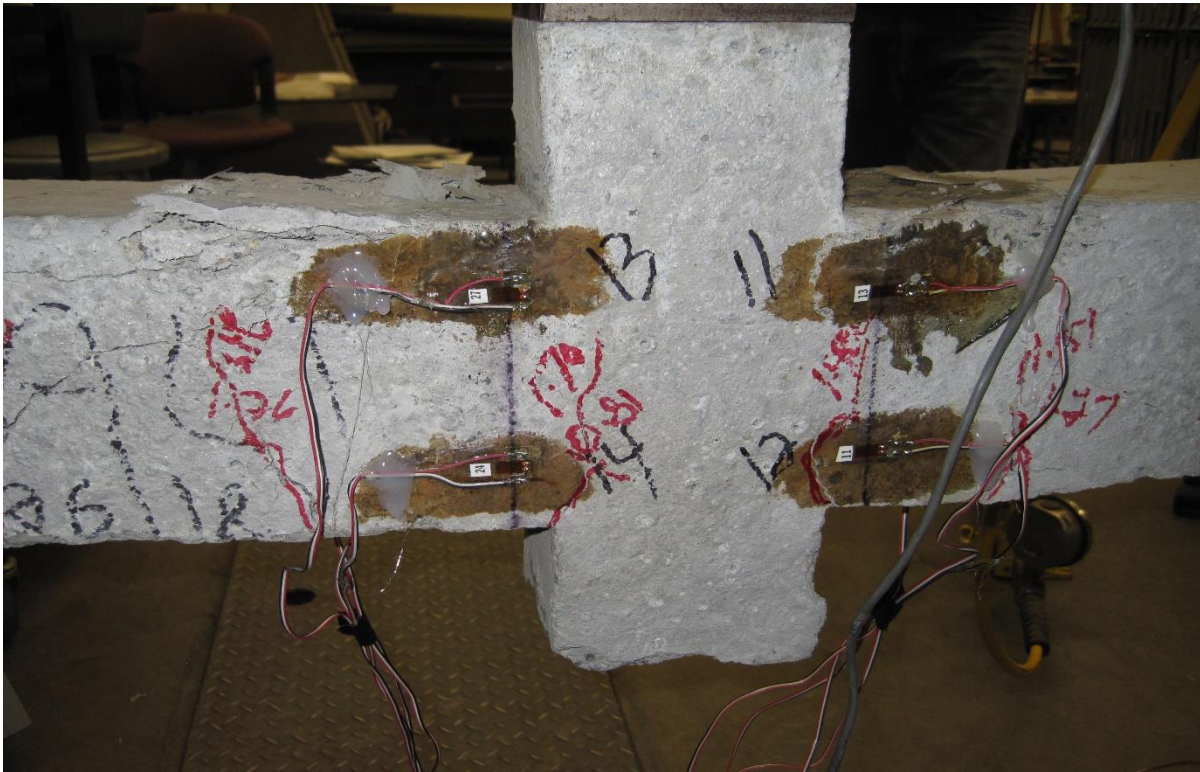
Missing Column Crack Pattern at the Collapsed Load for Specimen B2-1
